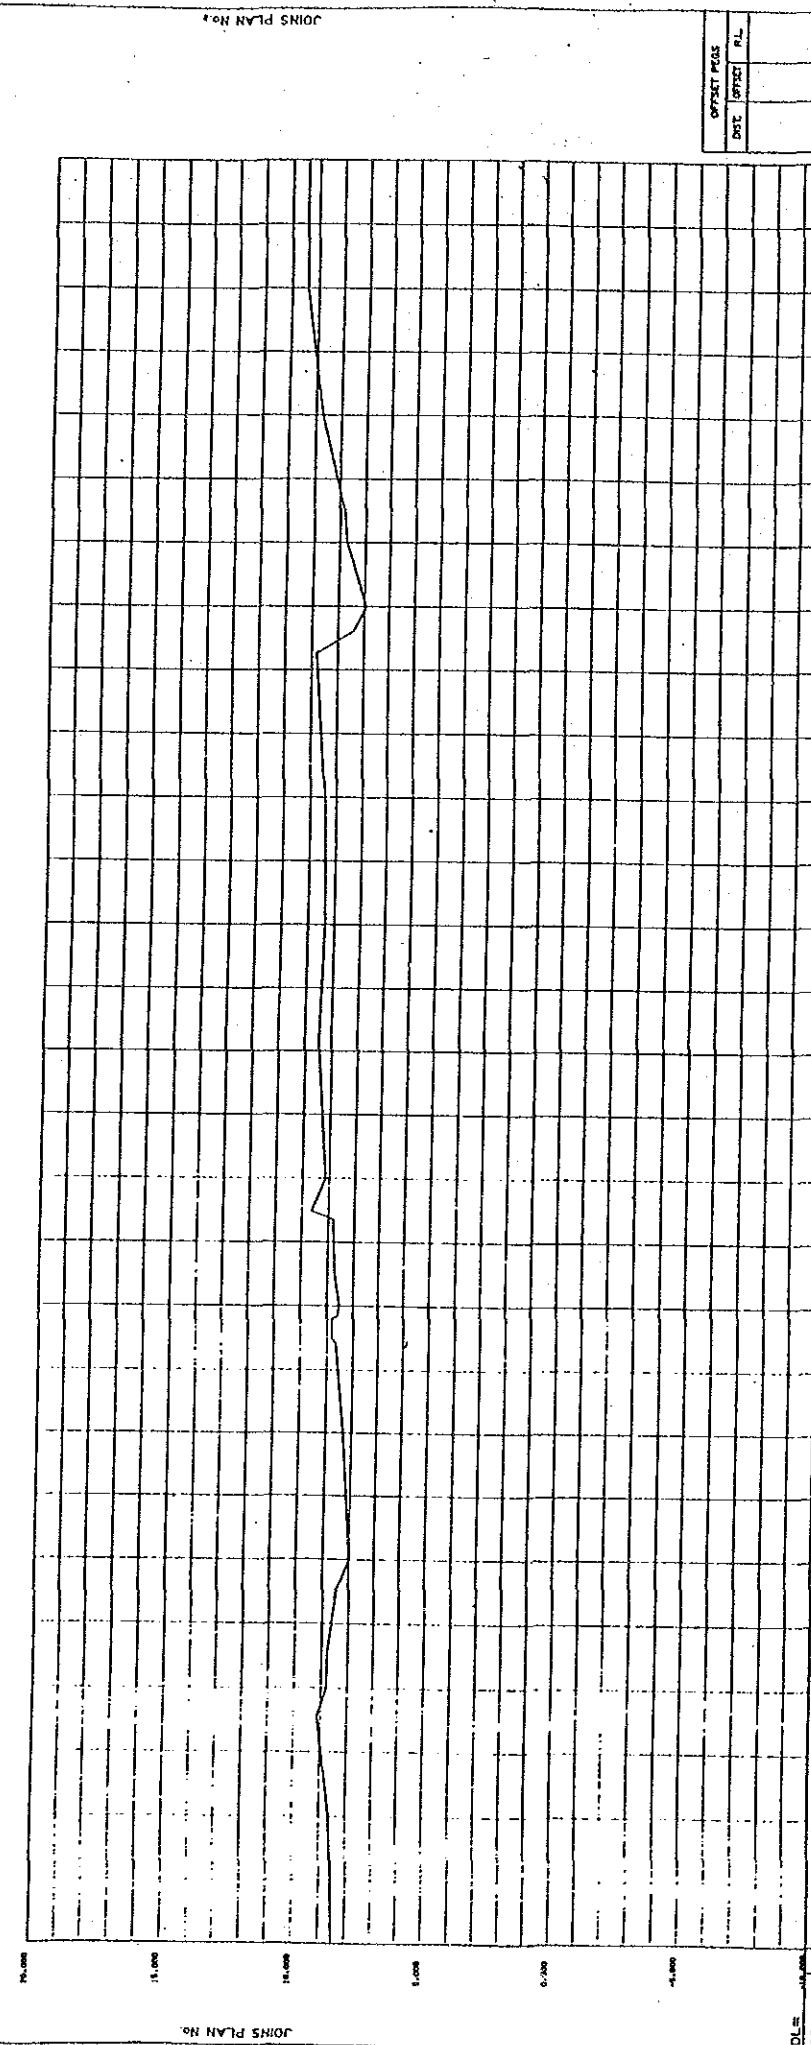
BERINA-MALALUA SECTION PLAN
